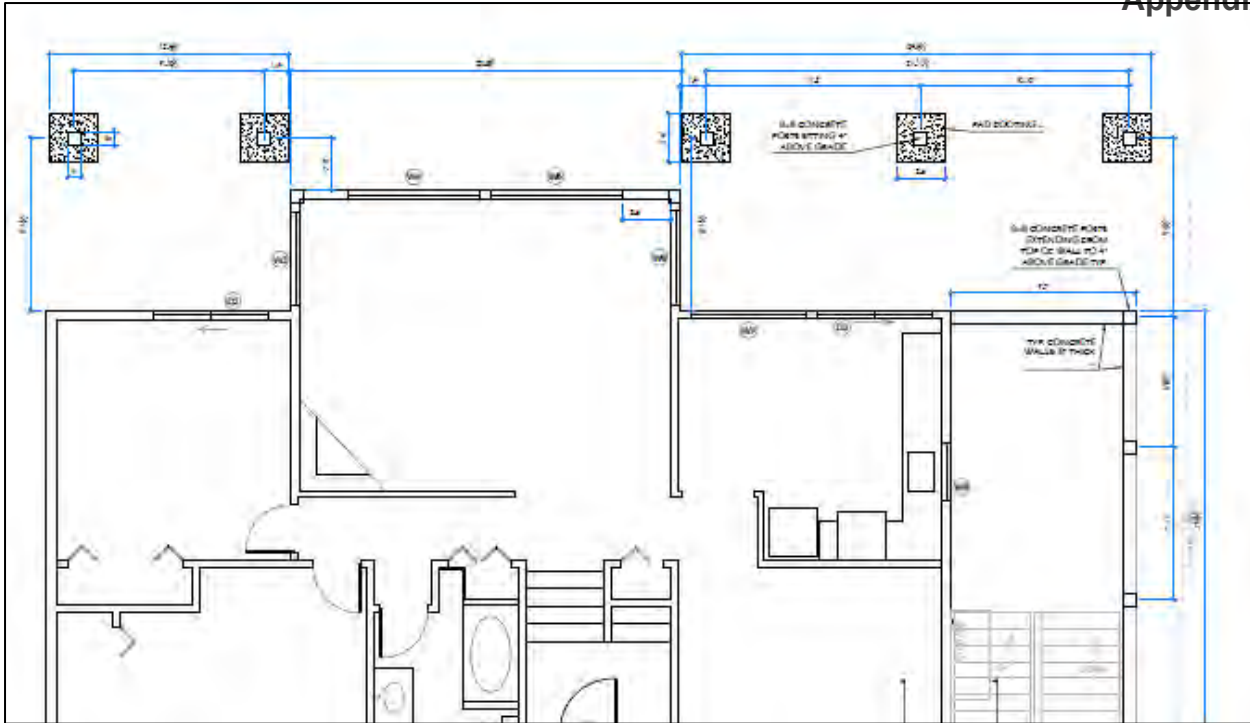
Aerial view of the proposed locations of concrete footings (north) and concrete wall (east) for the foundation. Drawings provided by Momentum Design Build.
